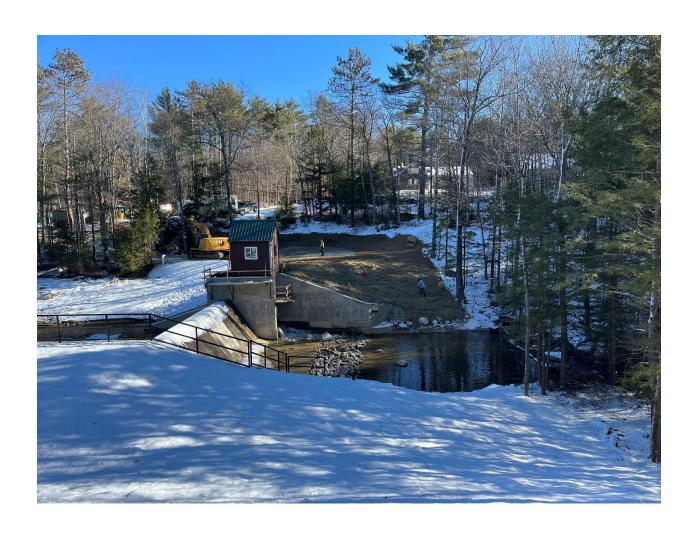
looking south right side of dam during re-construction. 12/4/2024
